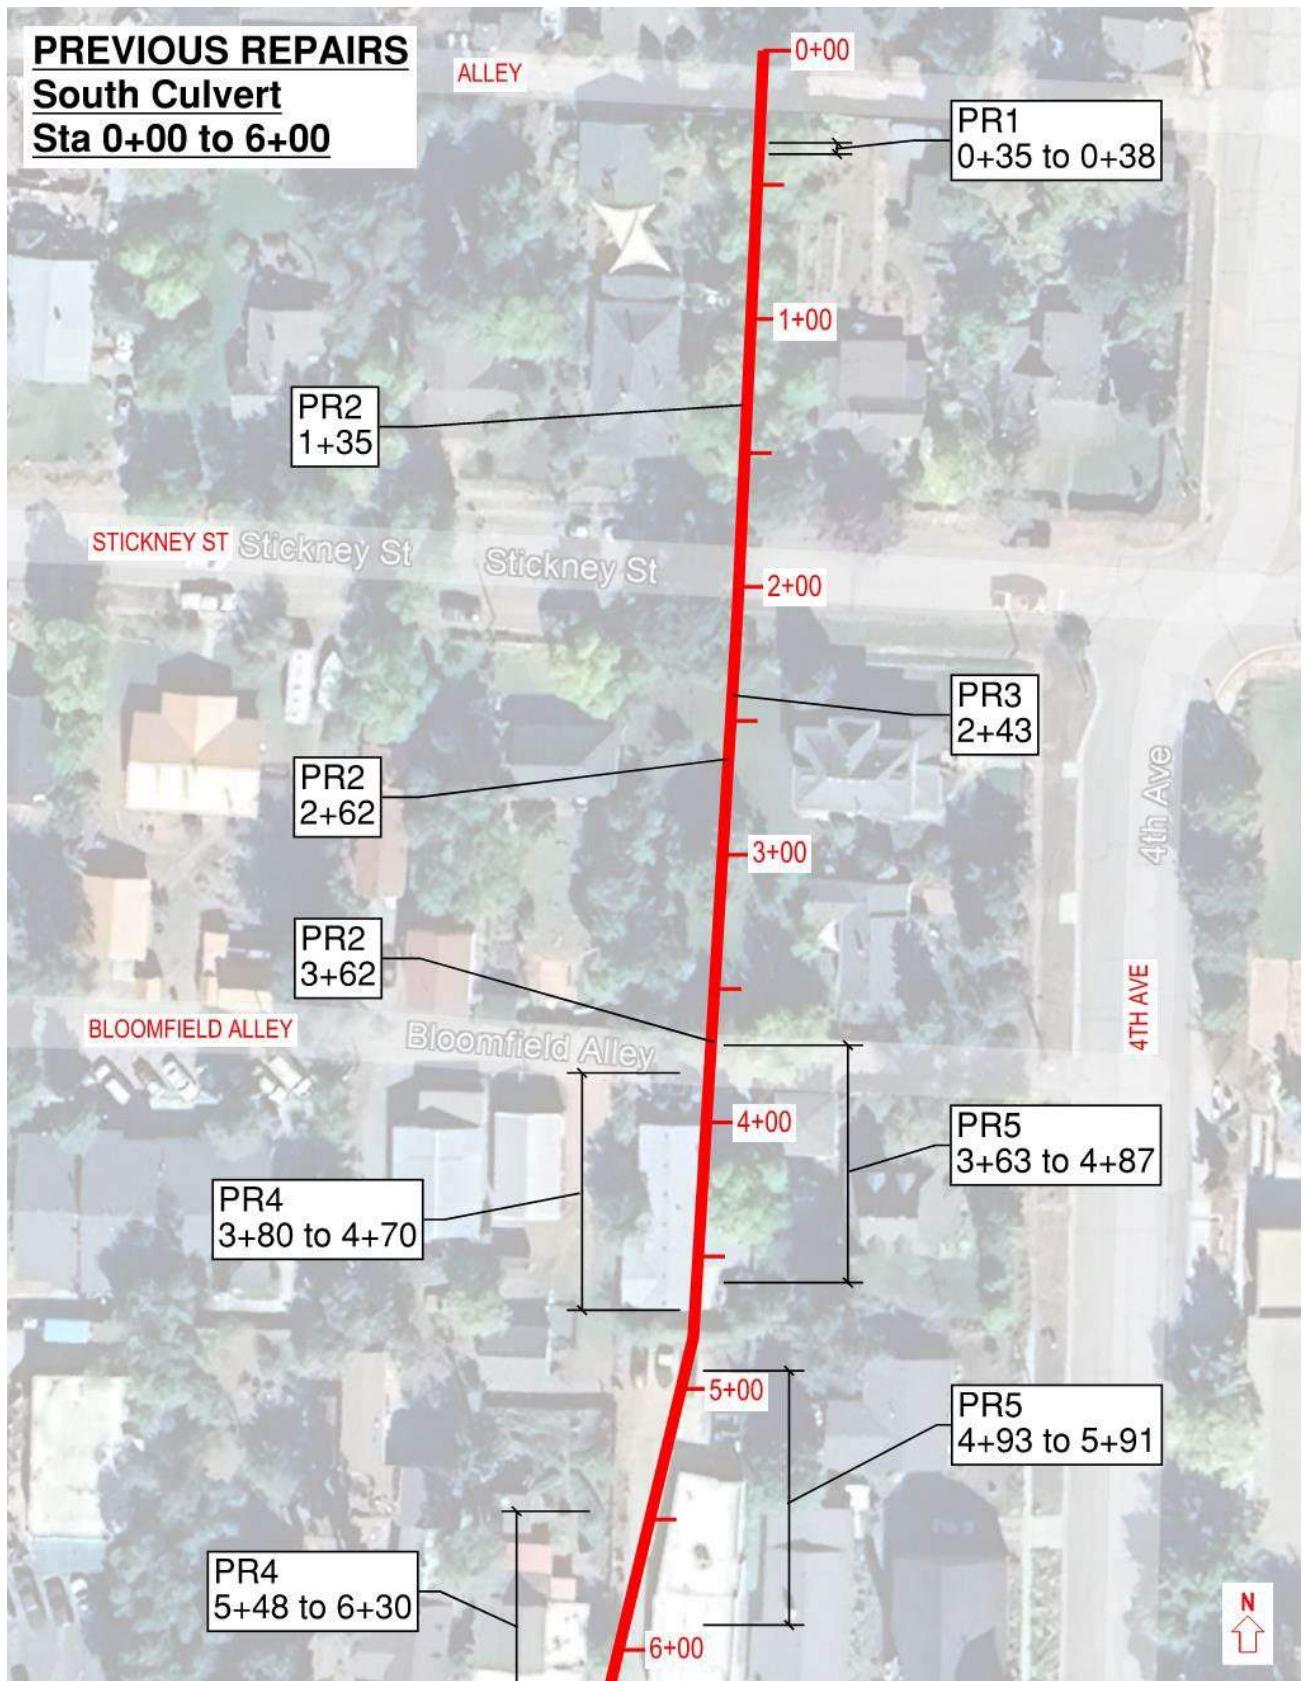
South Culvert Previous Repairs Stations (S)0+00 to (S)6+00
